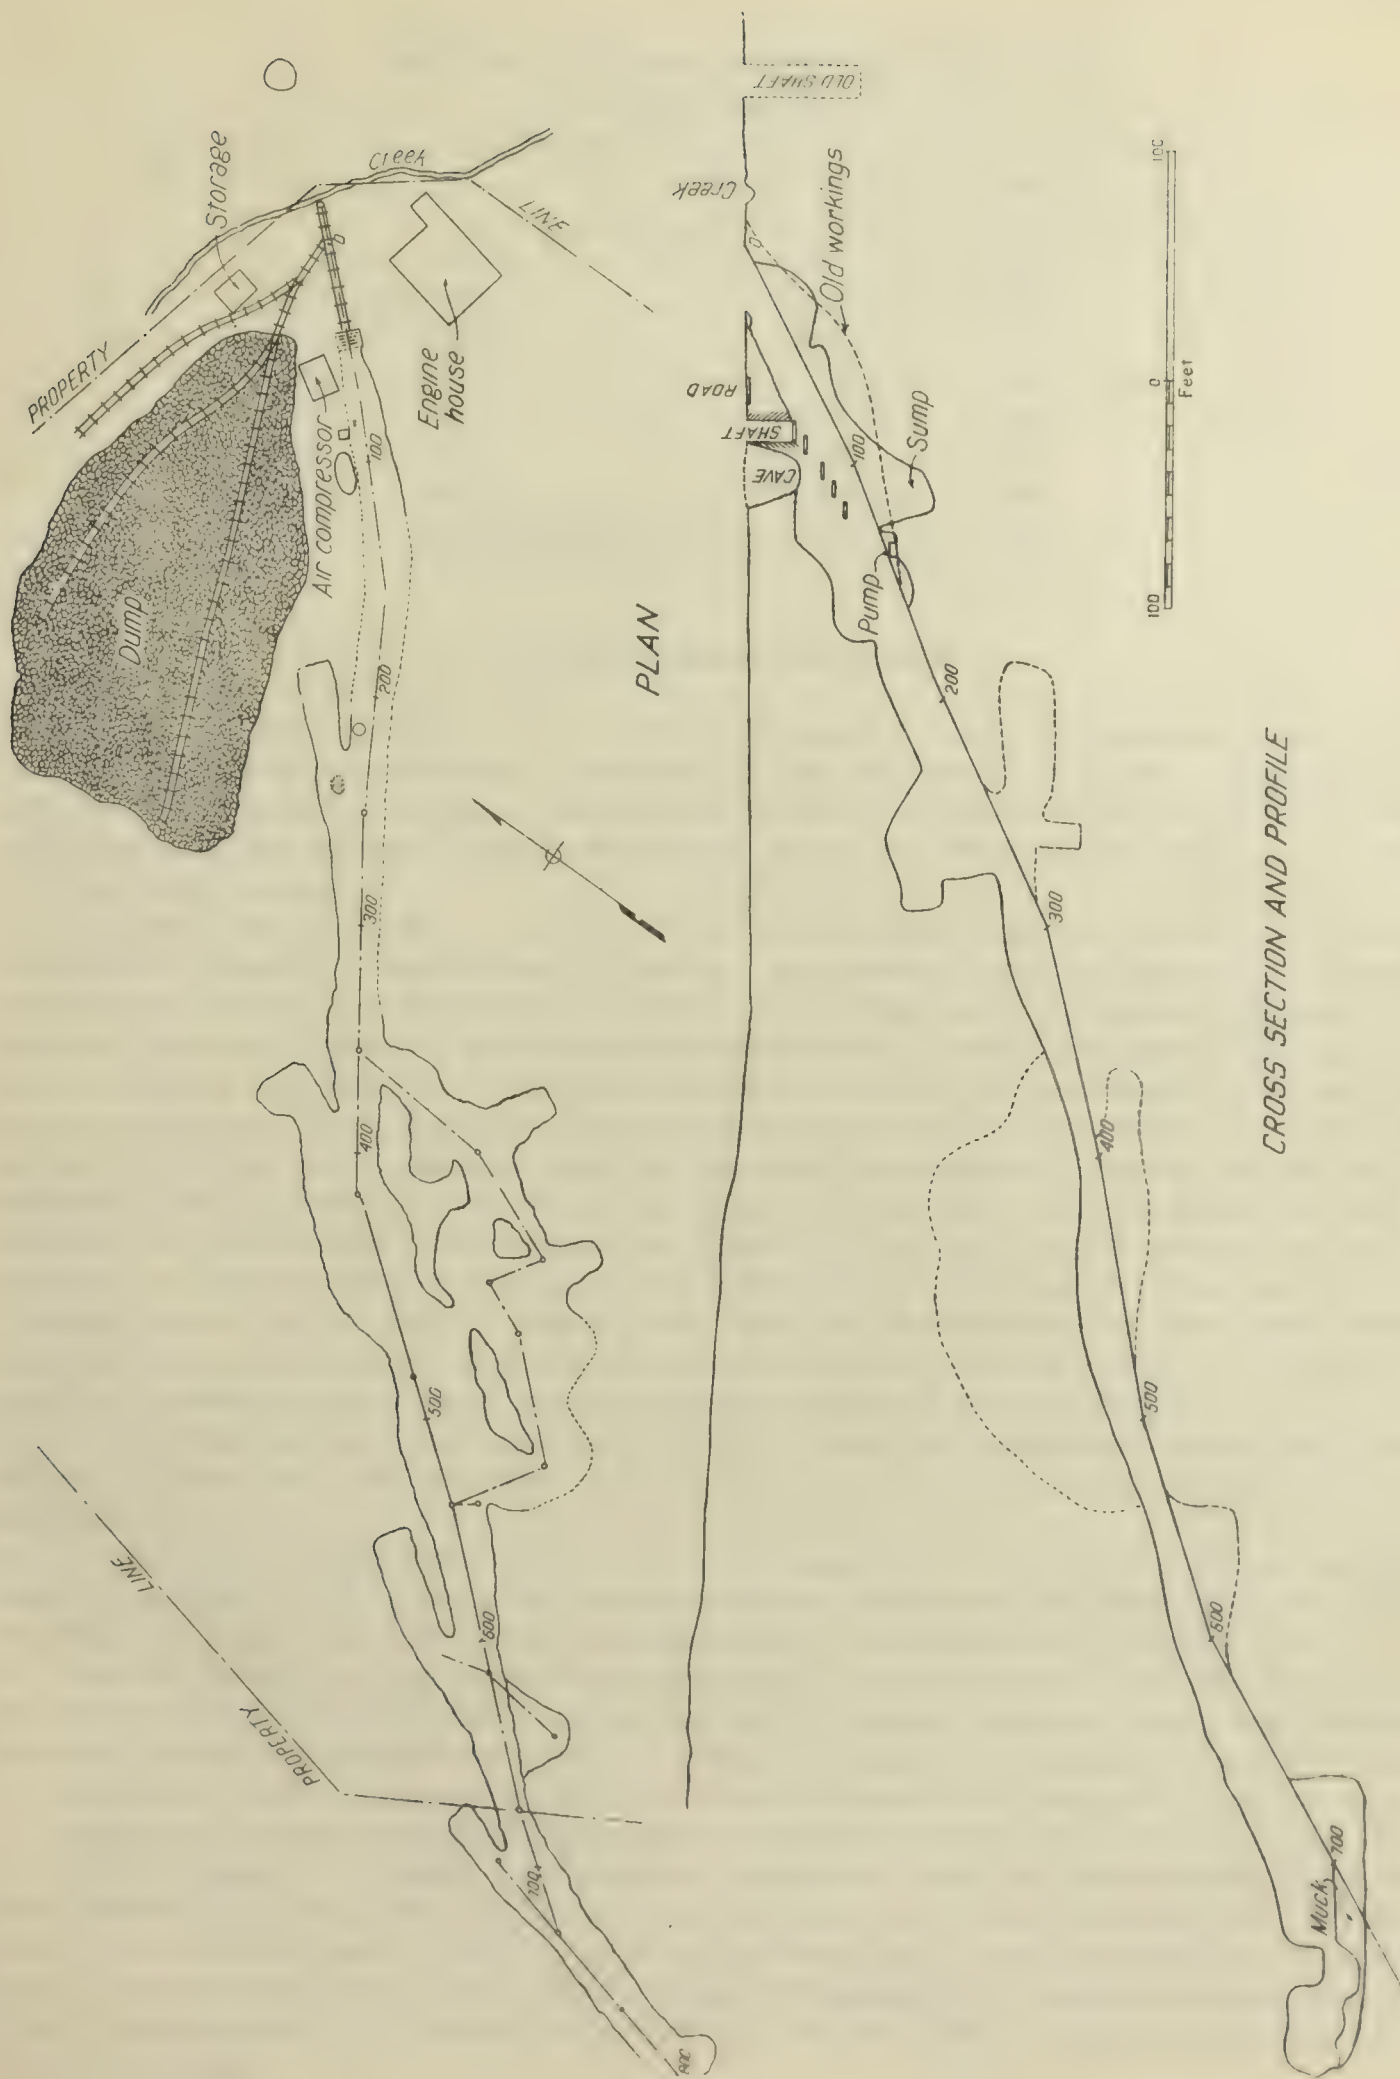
Plan and cross section of Spruce Pine No. 10 mine
